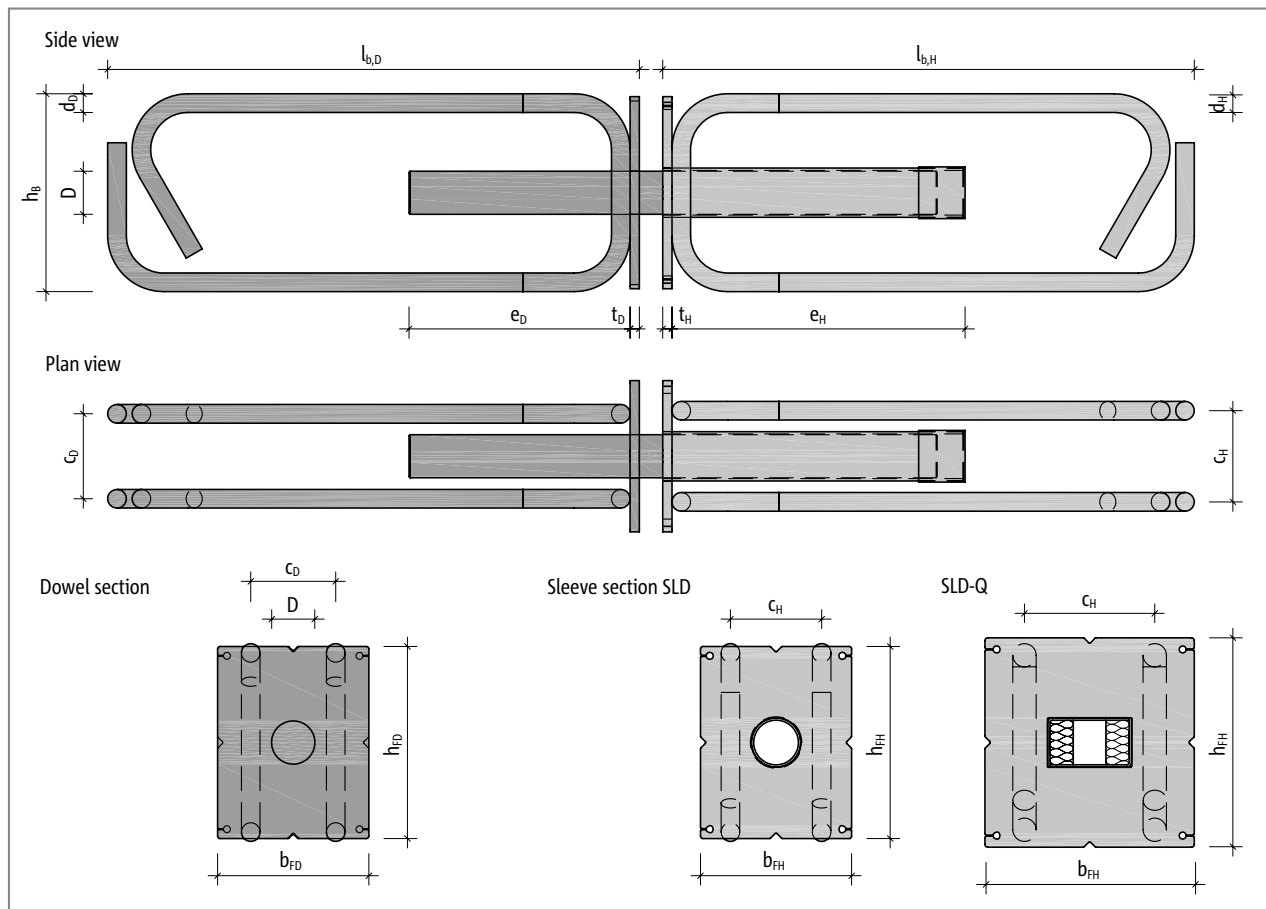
Schöck Dorn type SLD 120, SLD 150: Dimensions
